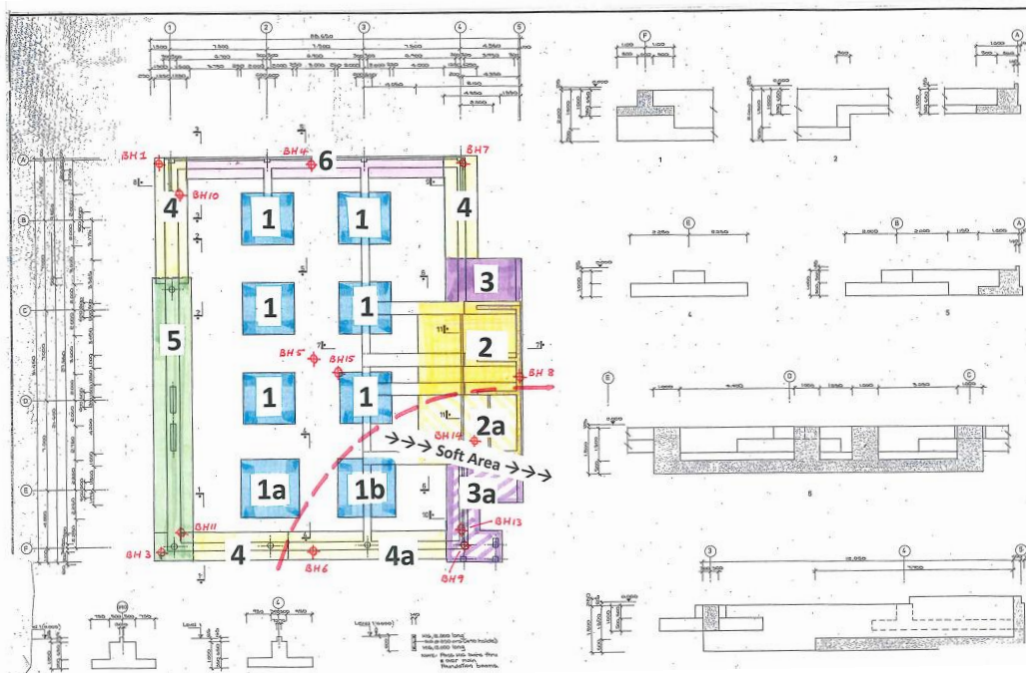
CTV foundation element location plan (Design Engineer 1986a)
